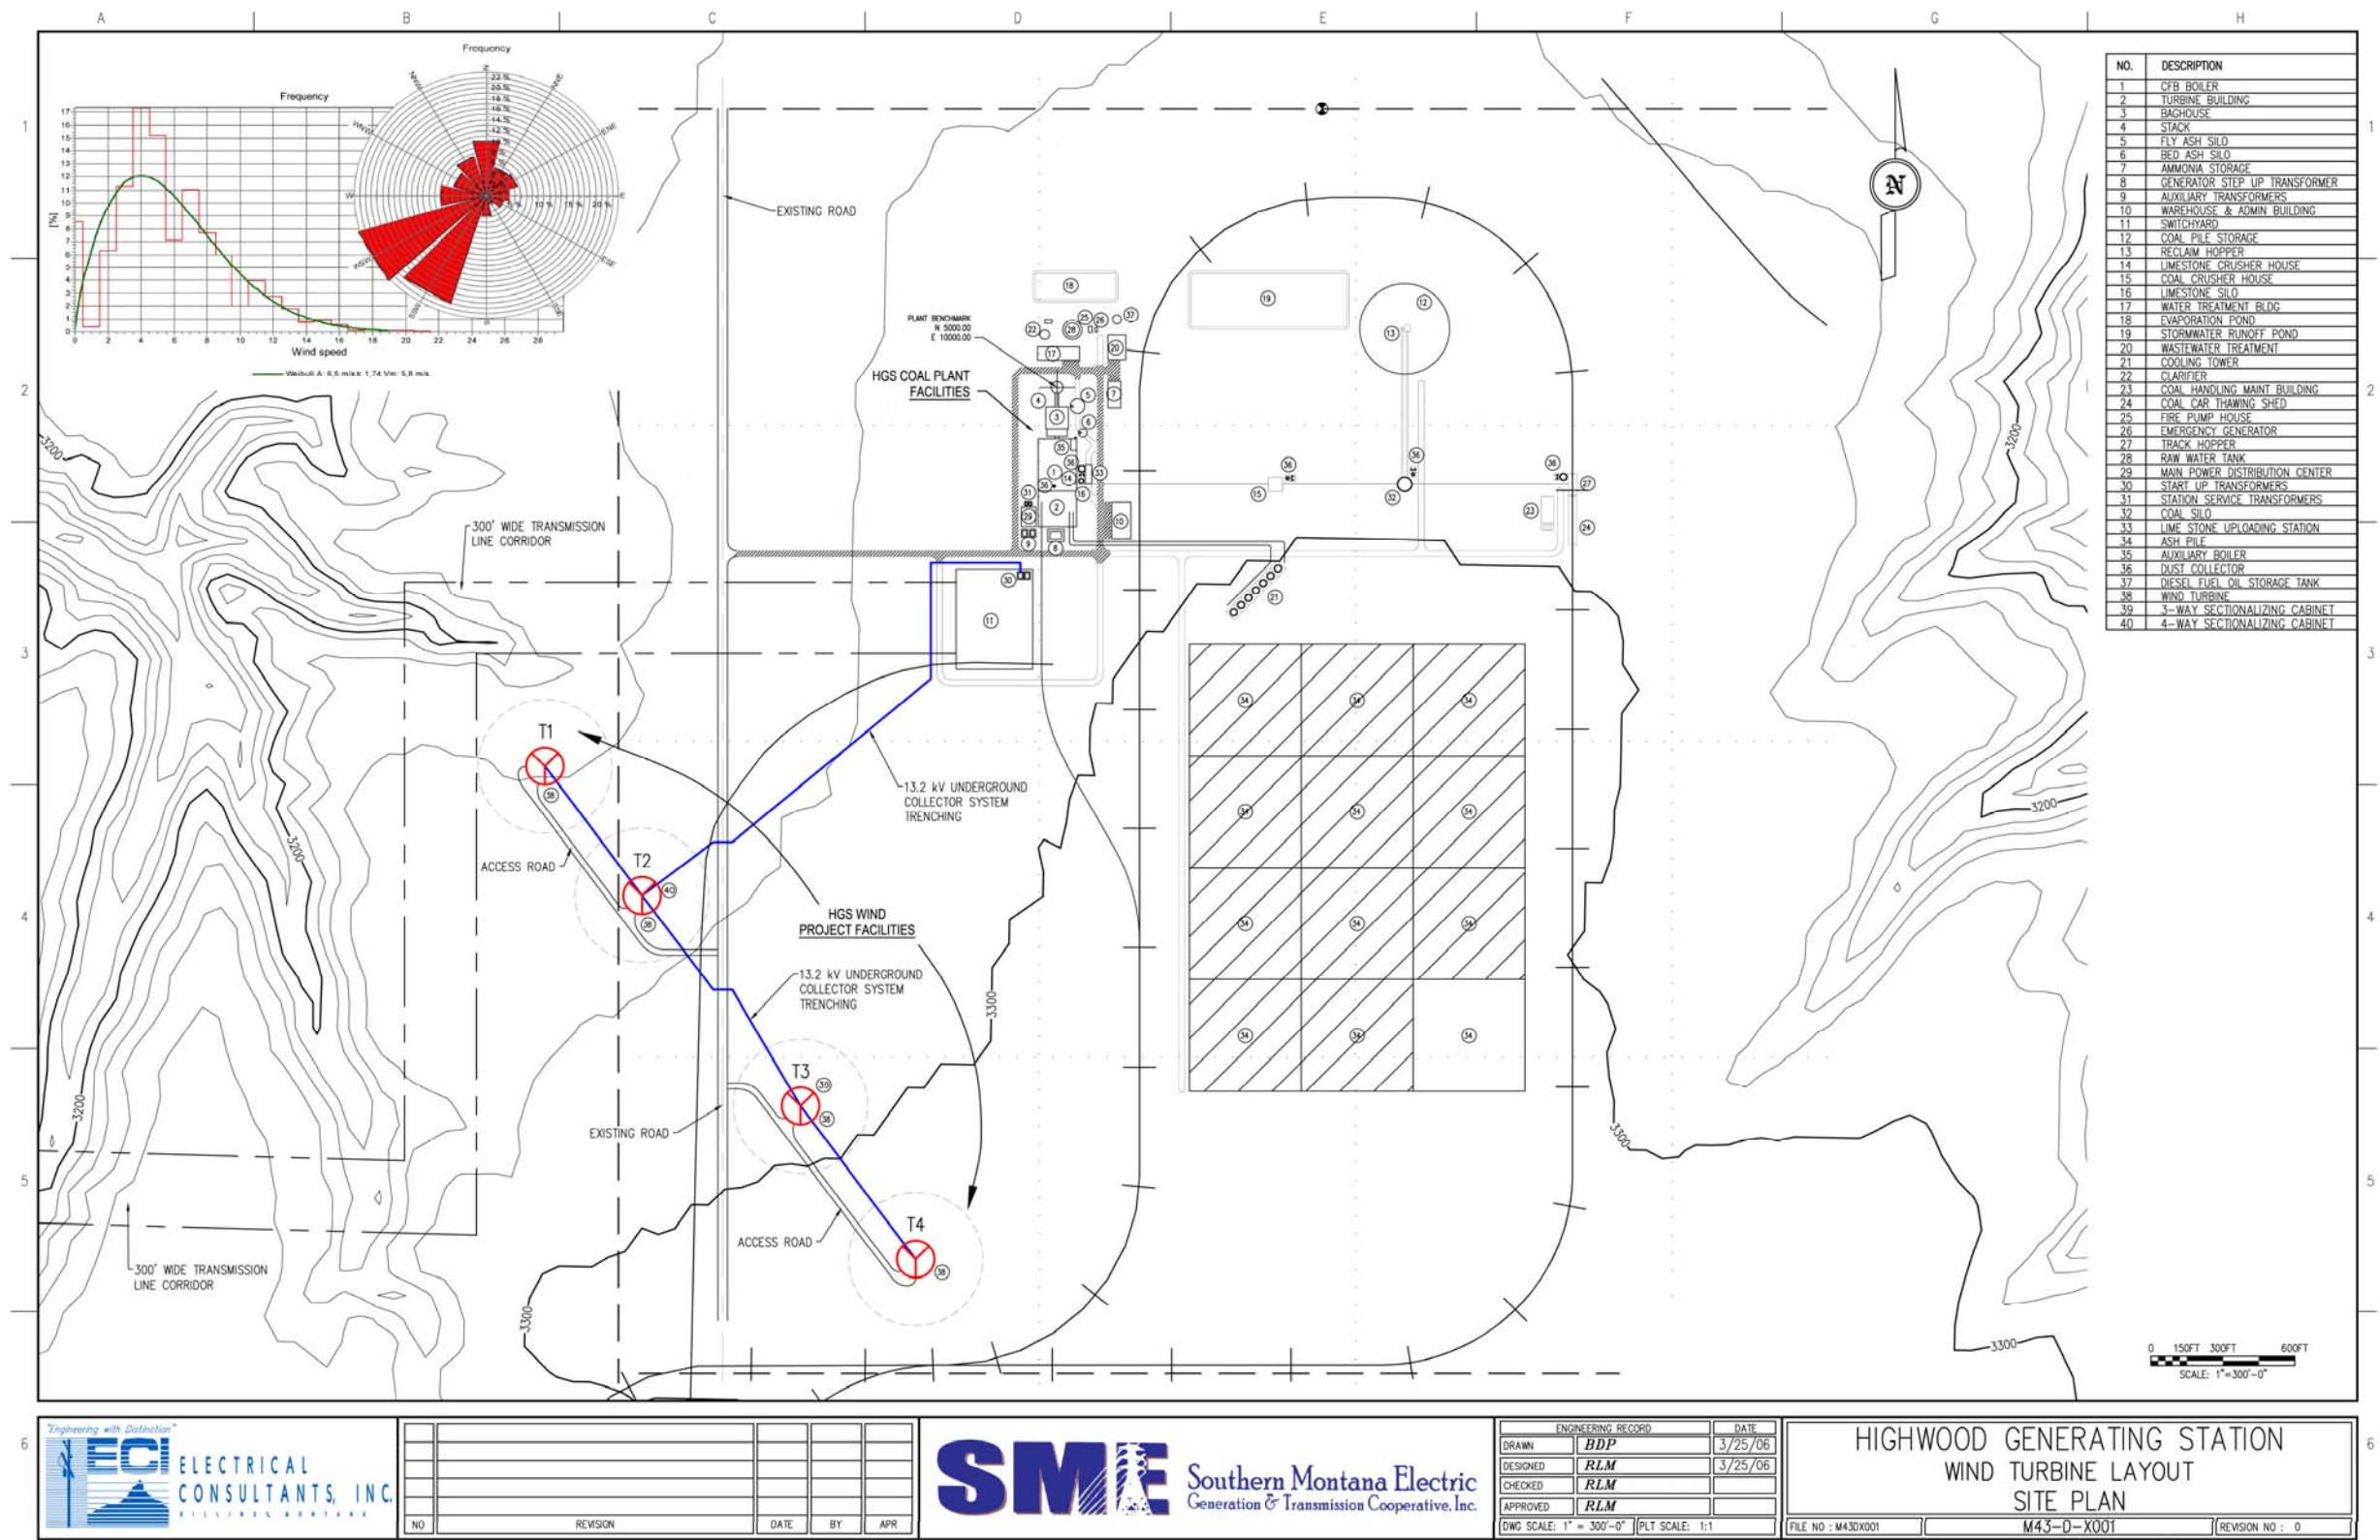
Preliminary HGS Wind Turbine Site Plan
